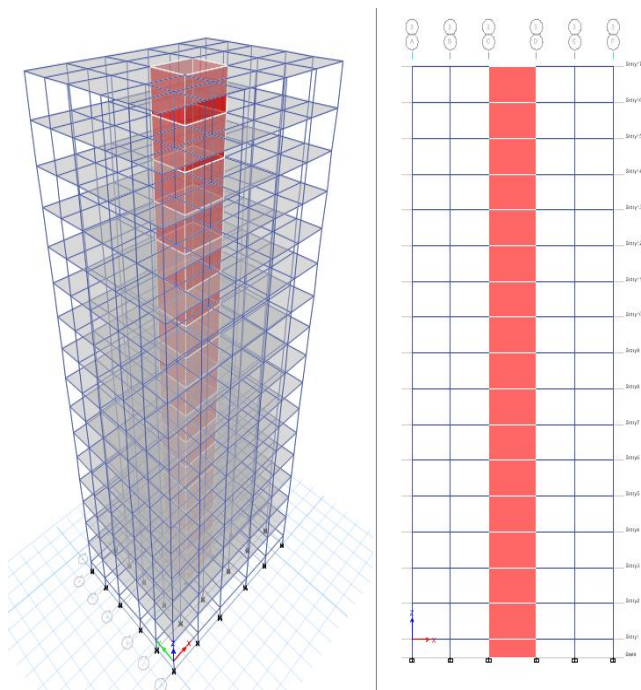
Fifteen storey (G+15) building with shear walls in central core
